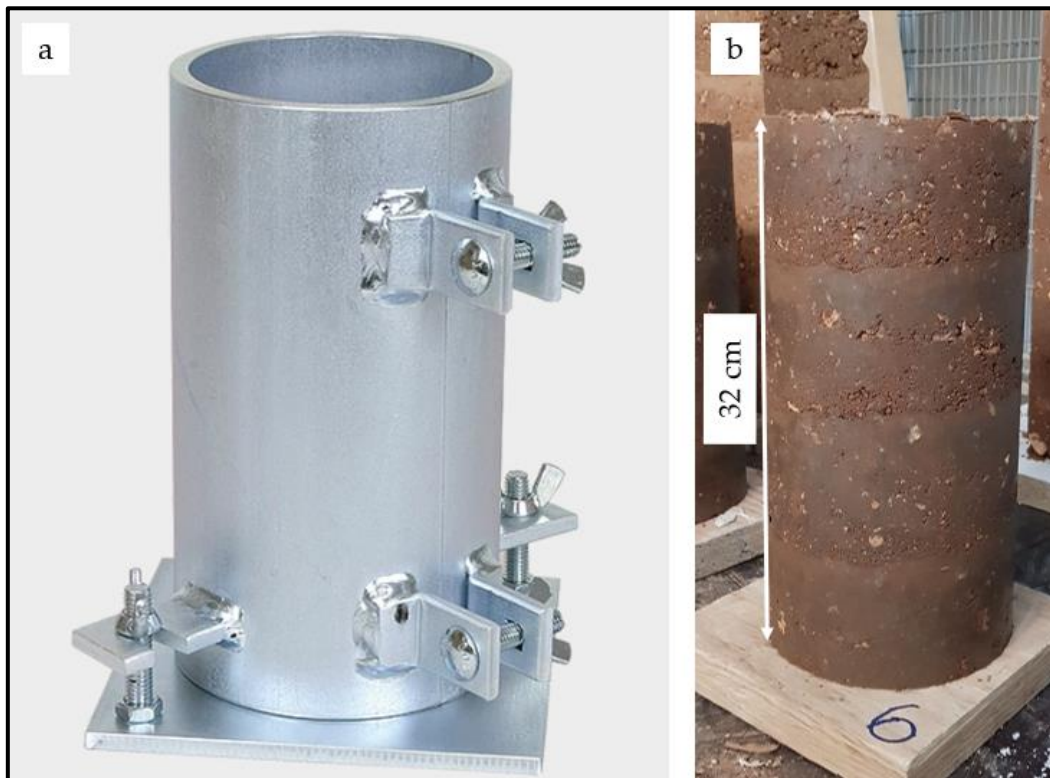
Cylindrical RE samples manufacturing; (a)Steel mould (b) Compacted sample
